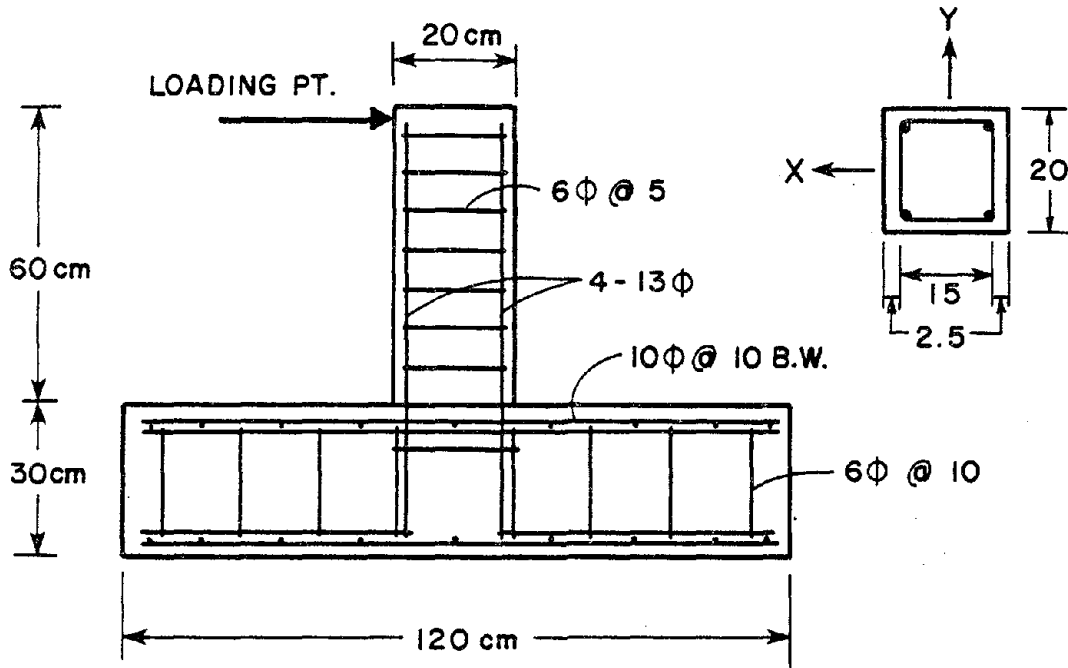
DIMENSIONS OF TEST SPECIMEN
